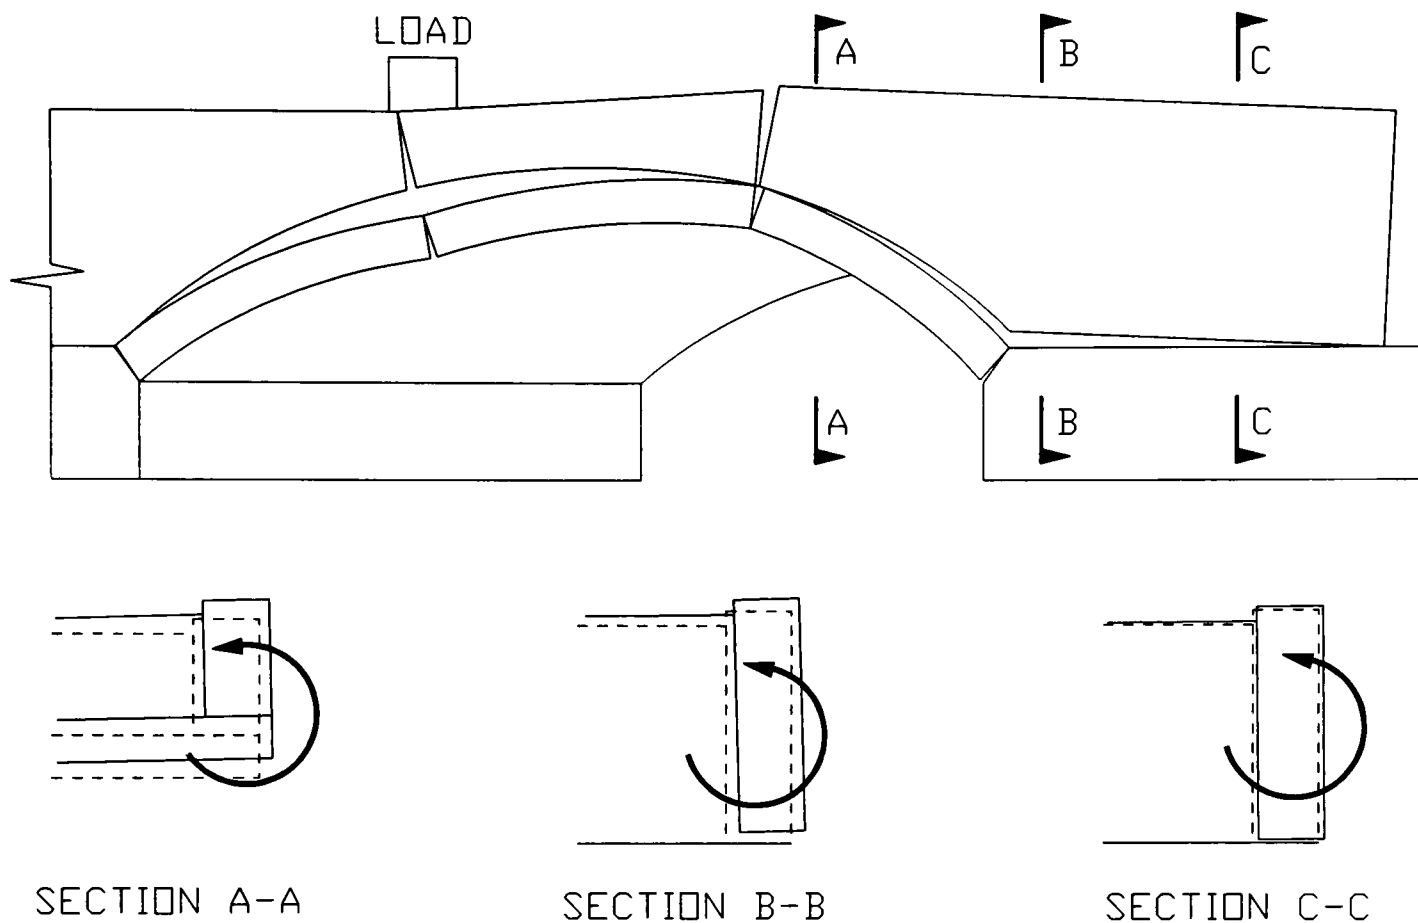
Deflection of Bridge 3-3 North East walls just before failure
